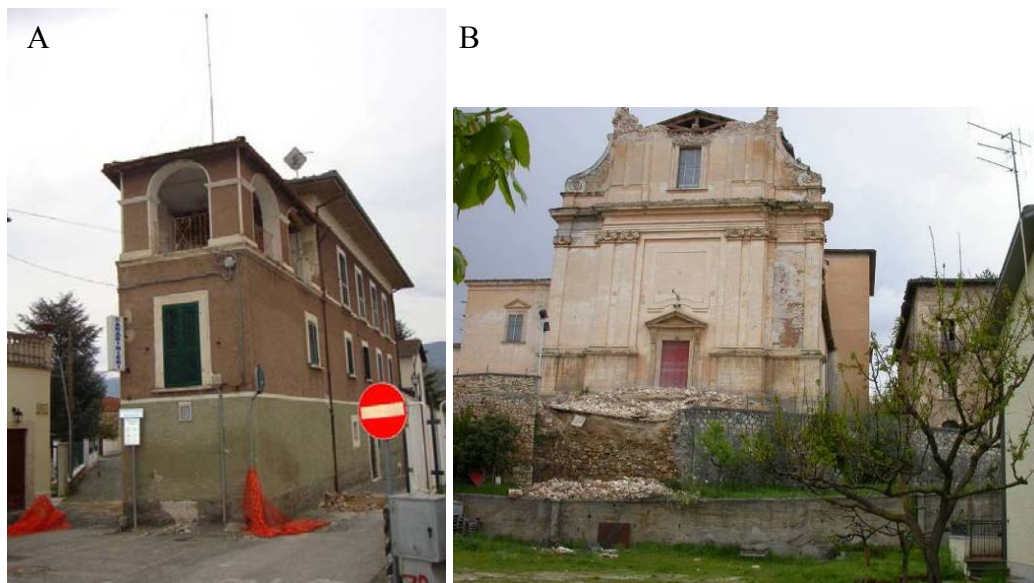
San Demetrio ne' Vestini. (A) "Caserma dei Carabinieri" with cracks (not evident in the picture) and falls from the highest story, (B) Partial collapse of the tympanum of the facade of the Madonna dei Raccomandati church.
